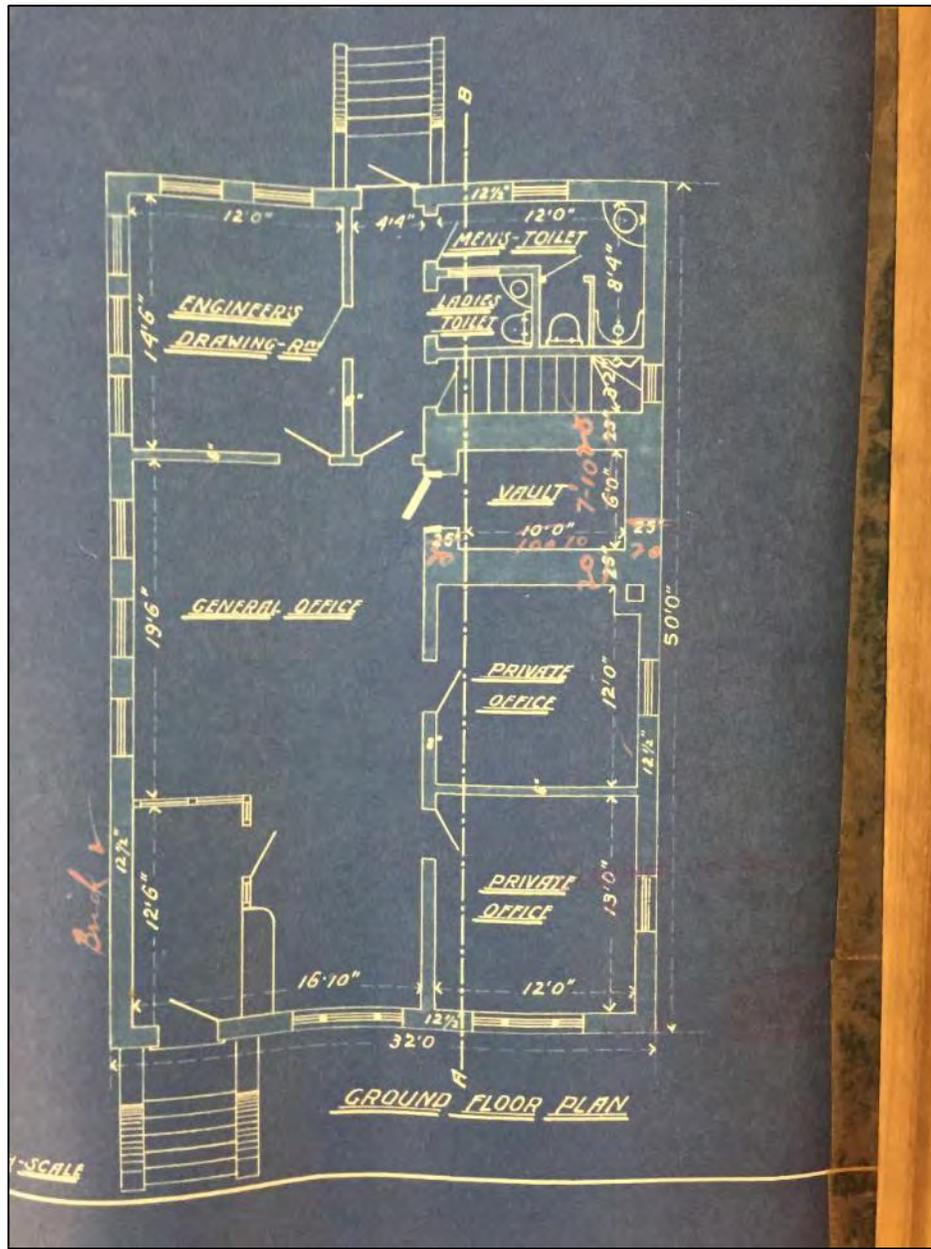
Mereen Johnson Office Building ground floor plan. "Mereen-Johnson Machine Company," Minneapolis Plan Vault Collection, Box 304, Northwest Architectural Archives, University of Minnesota.
